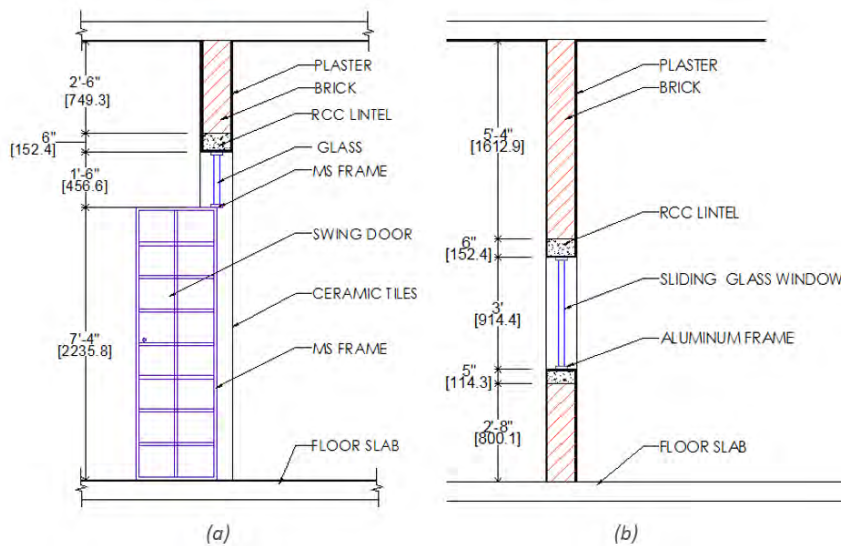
Existing envelope detail of Inpatient room of VIP (Ward no 04). (a) Door section on corridor side (b) window section.
